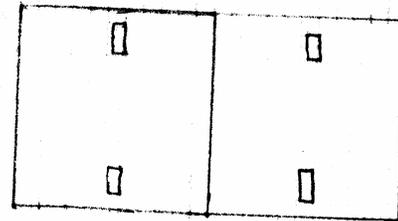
Sketch of pier construction detail. These are on top of the other layer. The scale is the same for both.
